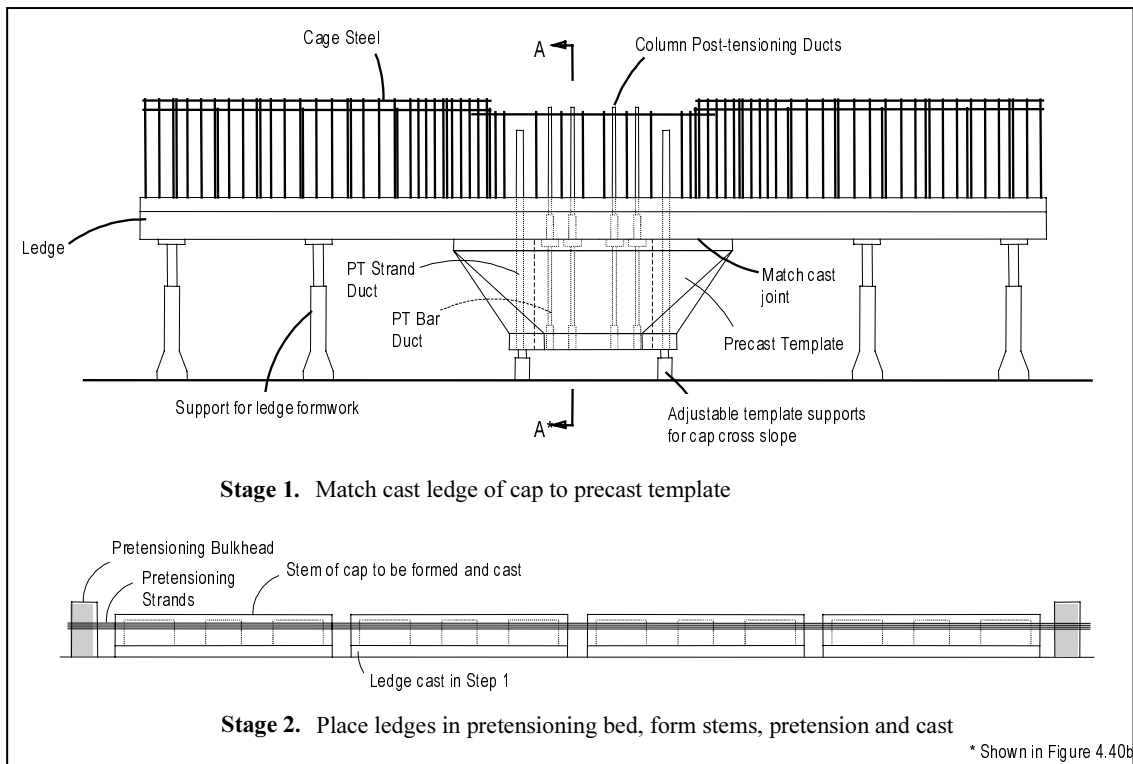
Two-stage match casting of precast, pretensioned inverted-T caps
